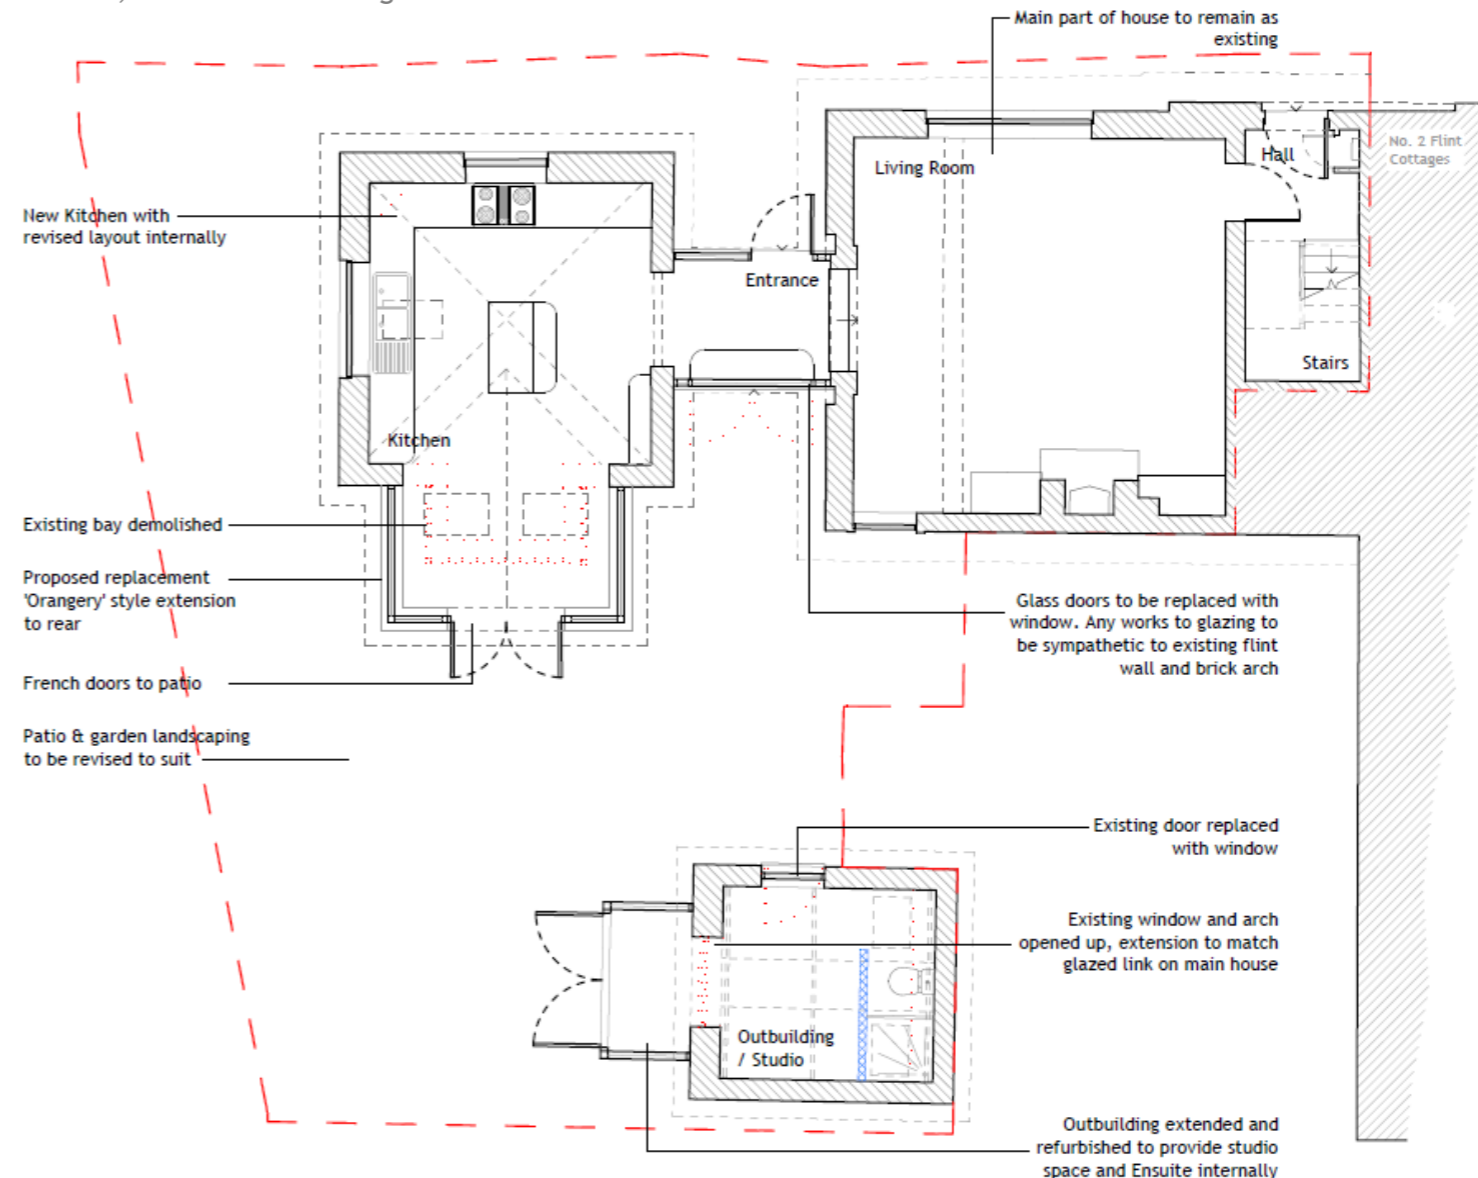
Proposed Floor Plan (not to scale - Please refer to the attached drawing series 23014 for more information.)
